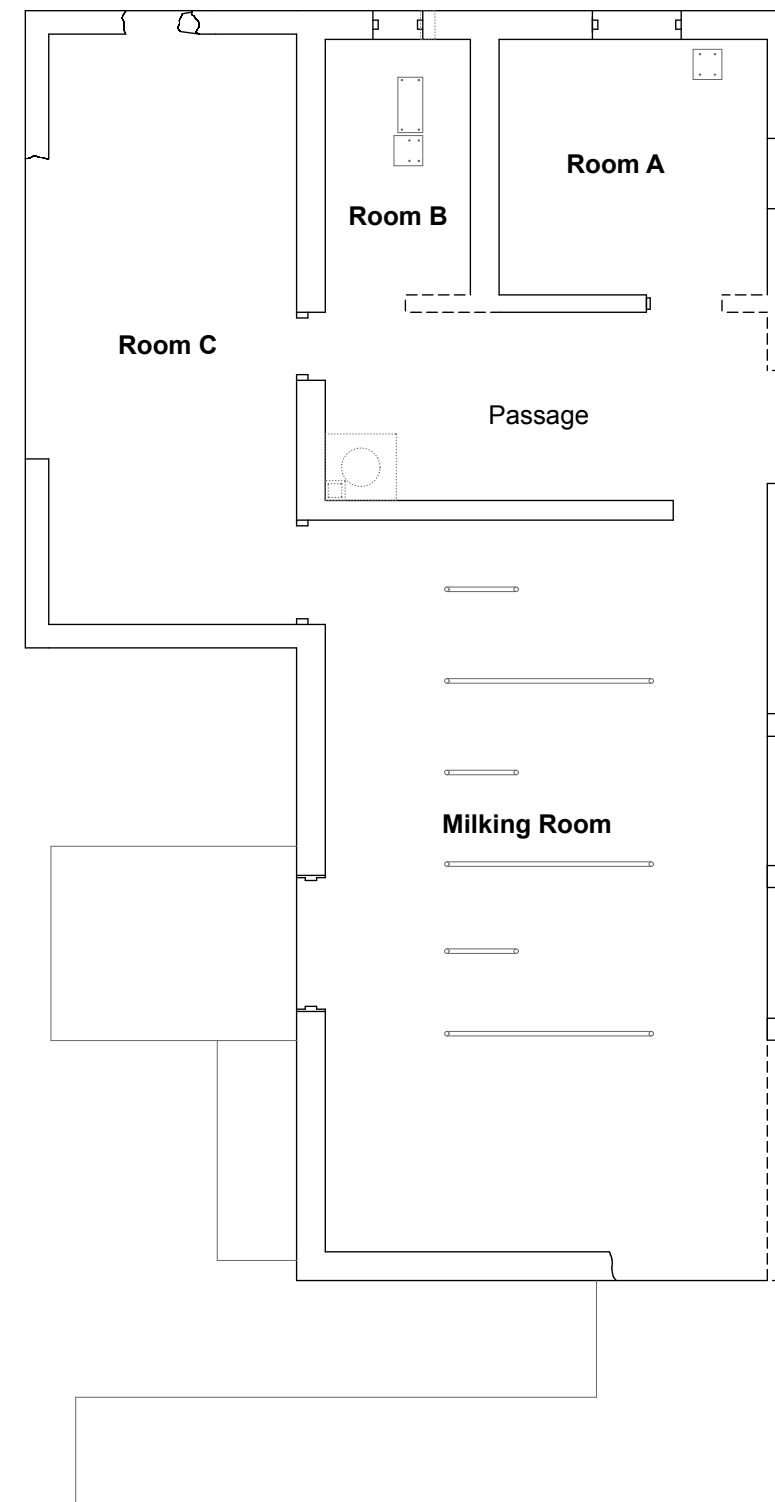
Site Plan, Chesterfield House Dairy (Palassis Architects, 2009)
